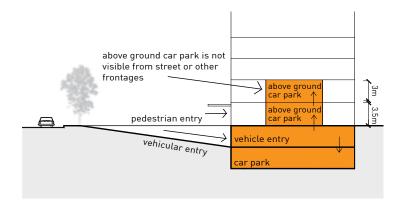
B.2-2: Multi-storey car park is housed within the building to facilitate active street frontages.
